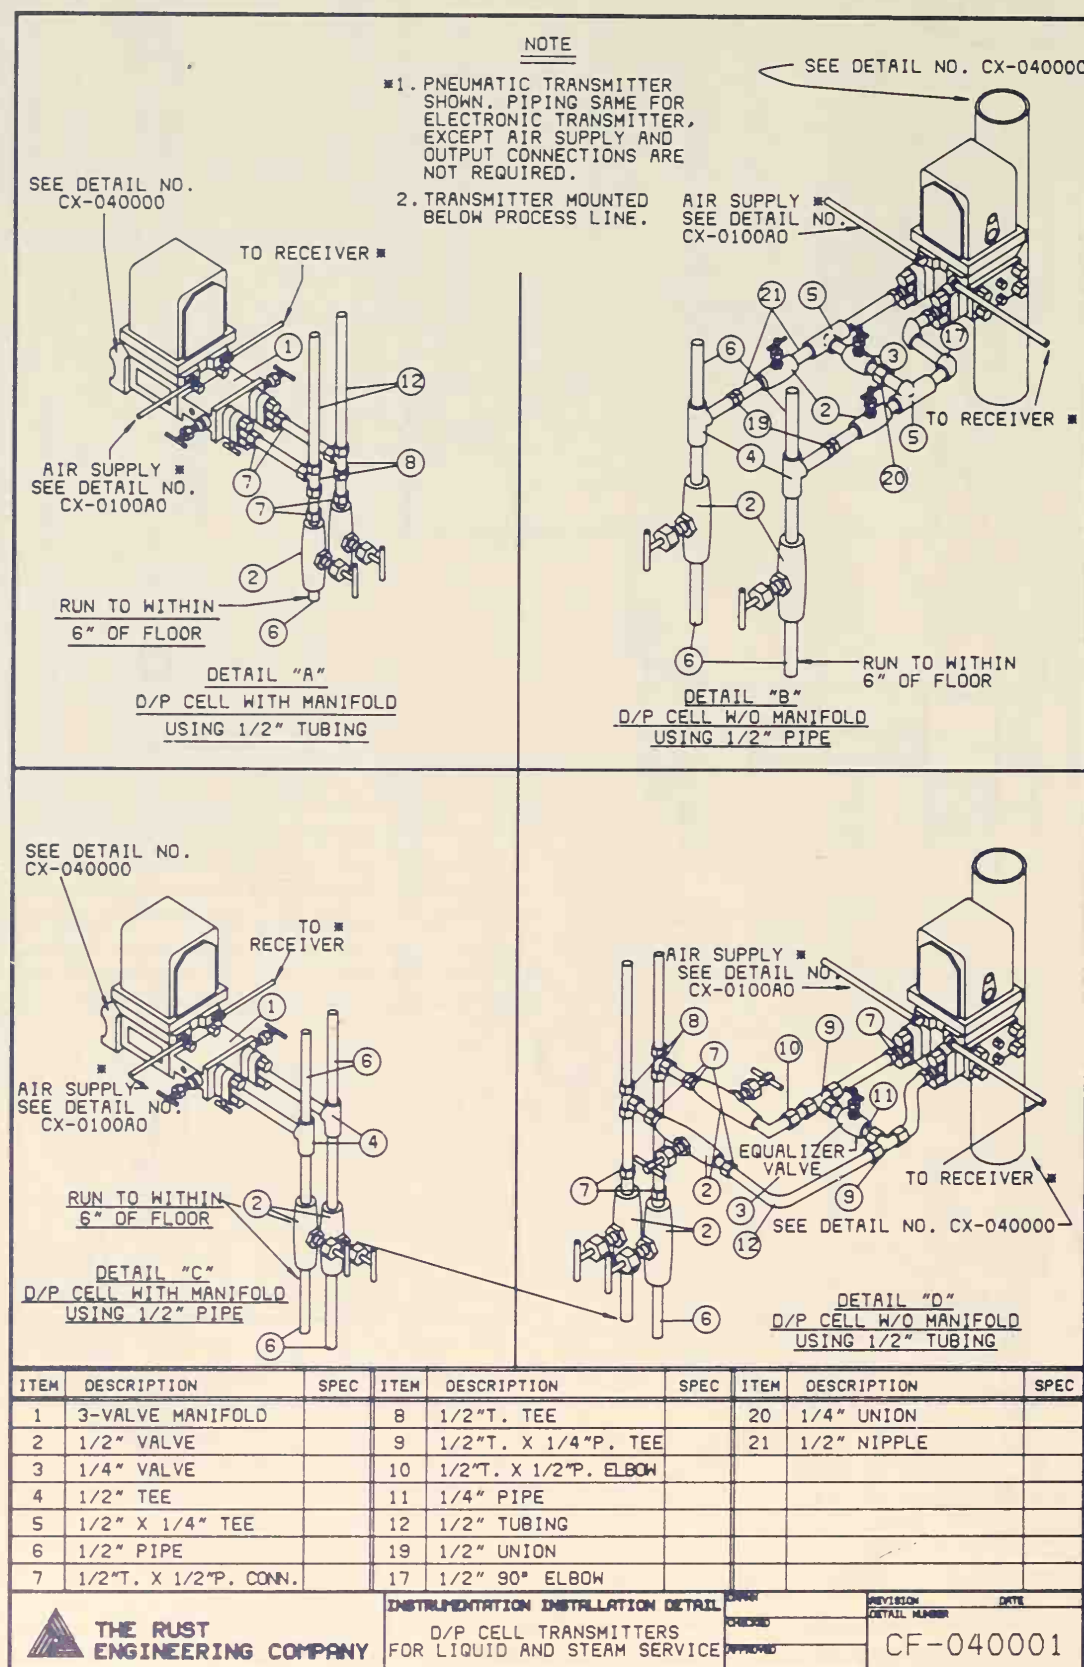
Isometric mechanical drawing (Courtesy The Rust Engineering Company)
